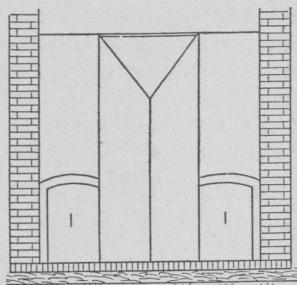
A hand-fired furnace, cross section along line *y-y'*, figure 30. 1, Openings in mixing structures.
